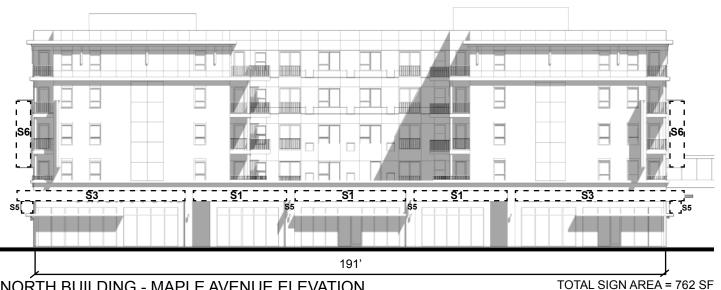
DETAILED SIGN ELEVATIONS
